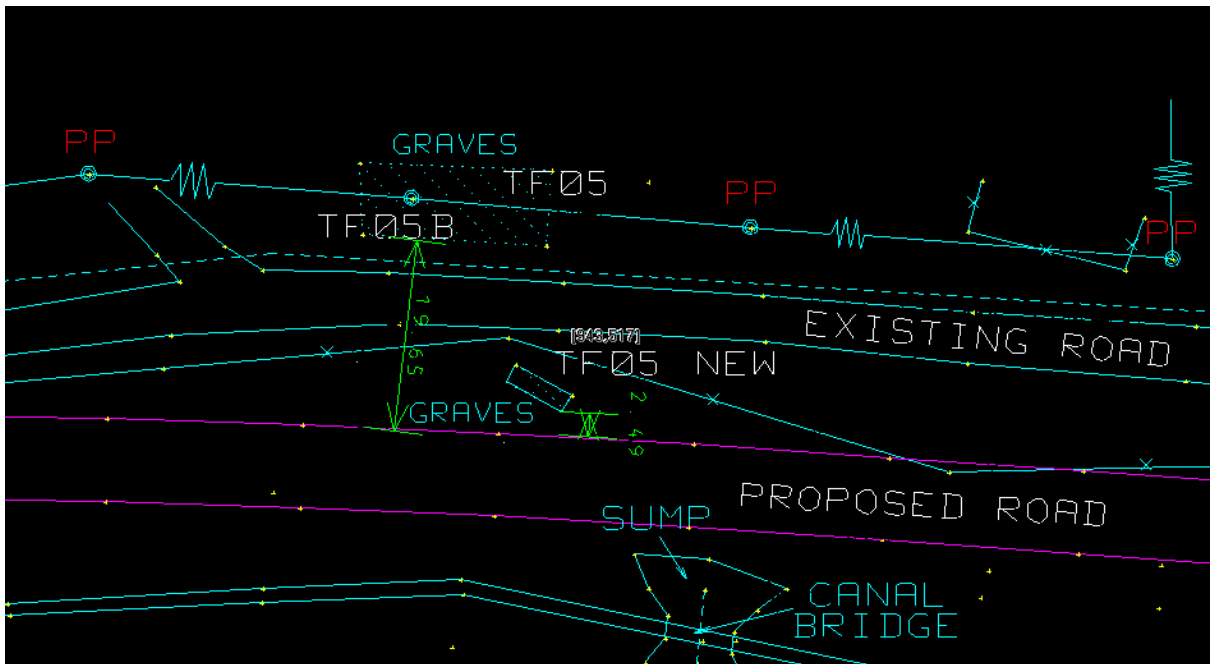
Position of grave sites TF05 adjacent to the new road alignment (Source: Neil Brand)
